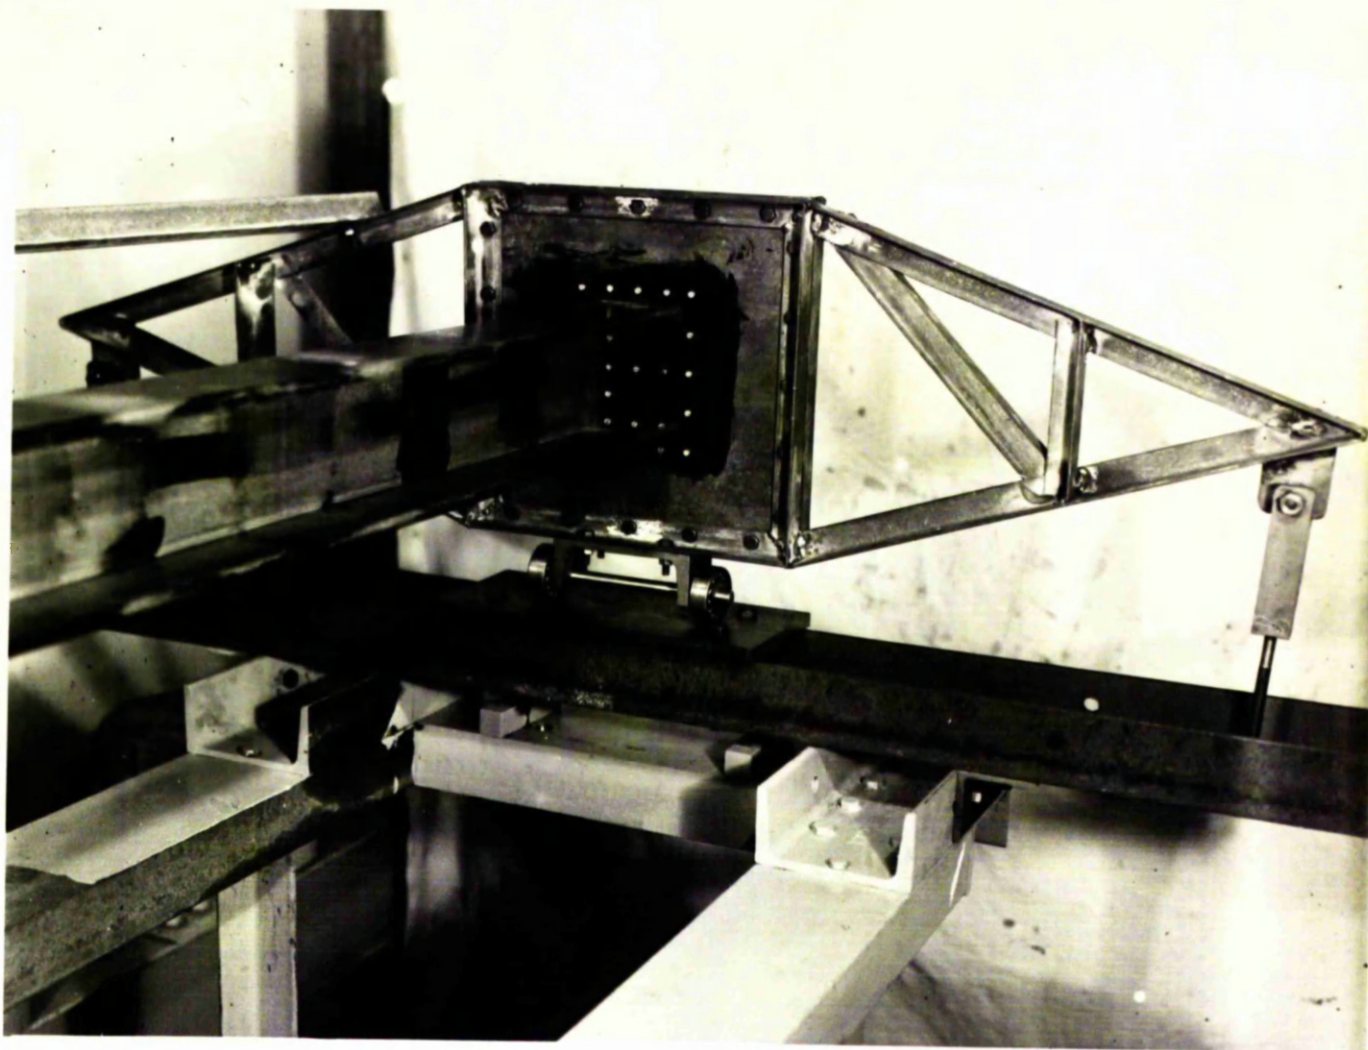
DETAIL OF ALUMINIUM ALLOY DIAPHRAGM
